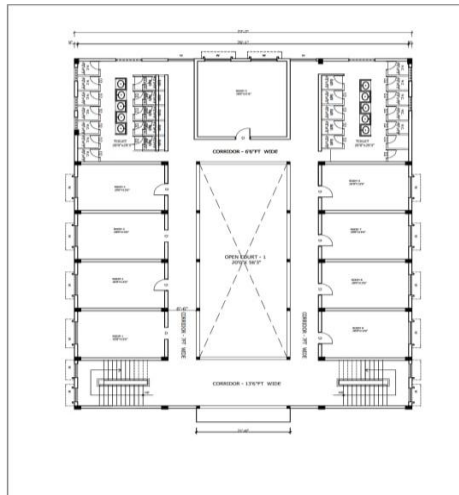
Typical Floor Plan(First Floor To Fifth Floor)
